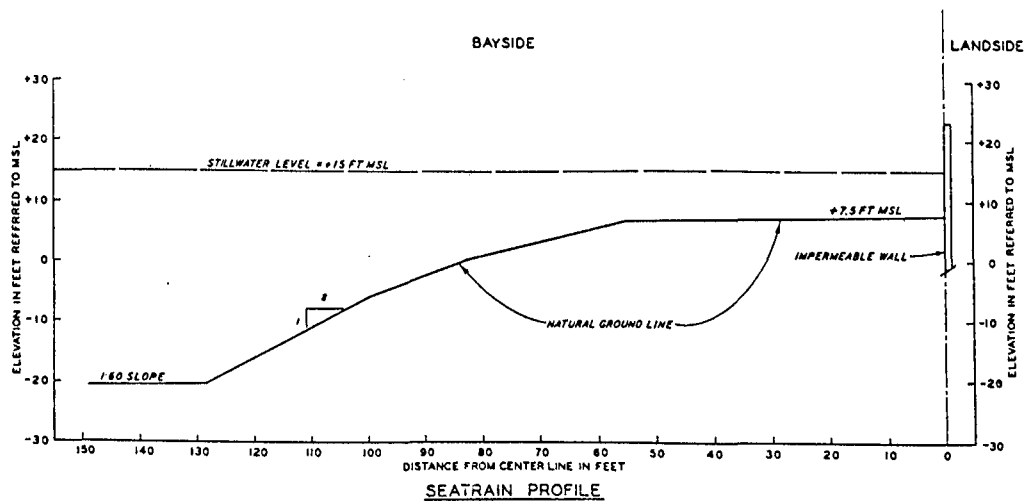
Elements of test section (plan 7), Texas City seawall model (Jackson, 1966).
